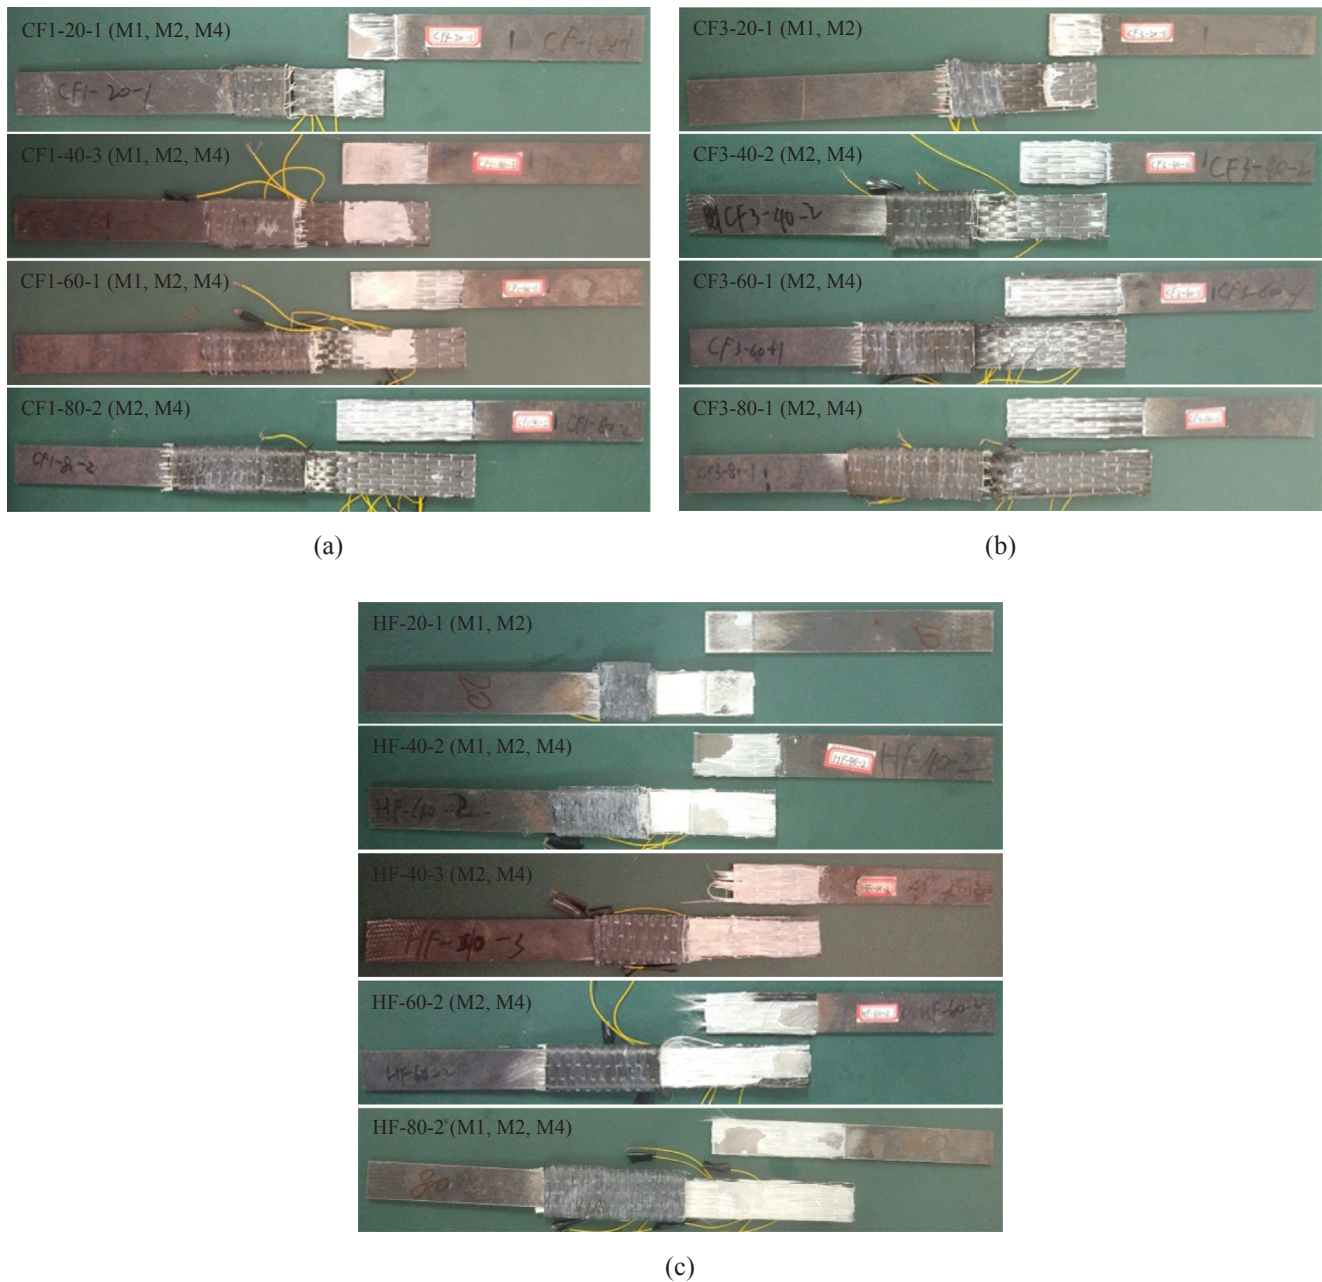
Typical failure modes of the specimens: (a) one-layered CFRP-to-steel joints; (b) three-layered CFRP-to-steel joints; and (c) three-layered hybrid FRP-to-steel joints.
